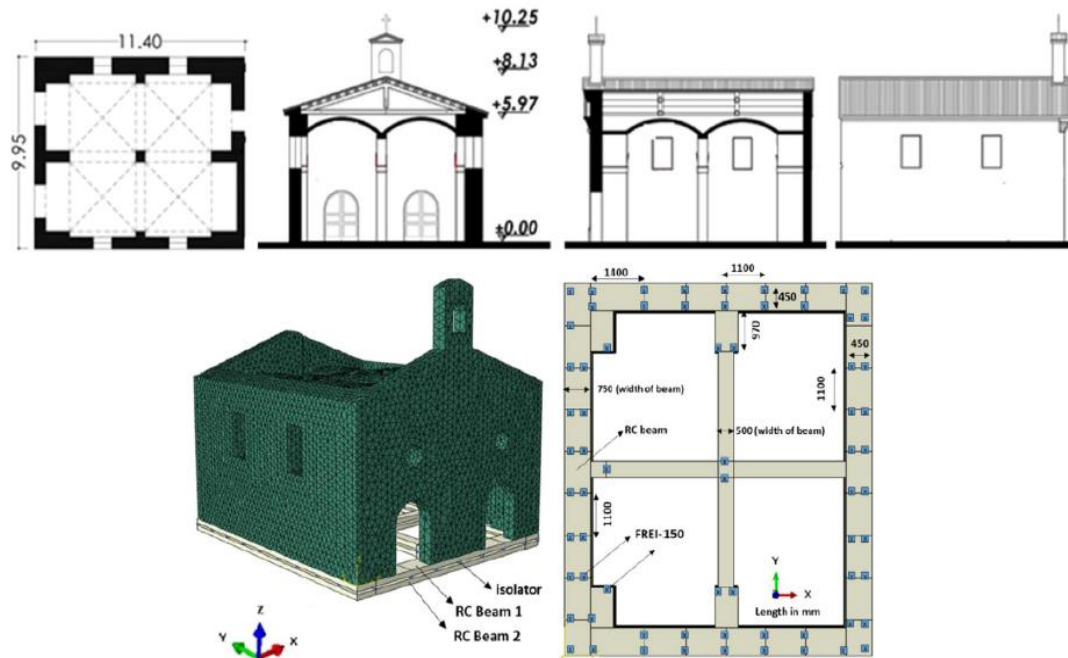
5 Top: drawings of the masonry church: plan, two sections and an elevation lateral view. Bottom: FE model of the isolated masonry church and arrangement of FREIs.
